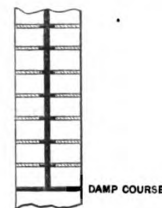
Showing Vertical and Horizontal Damp Courses in a Wall.
